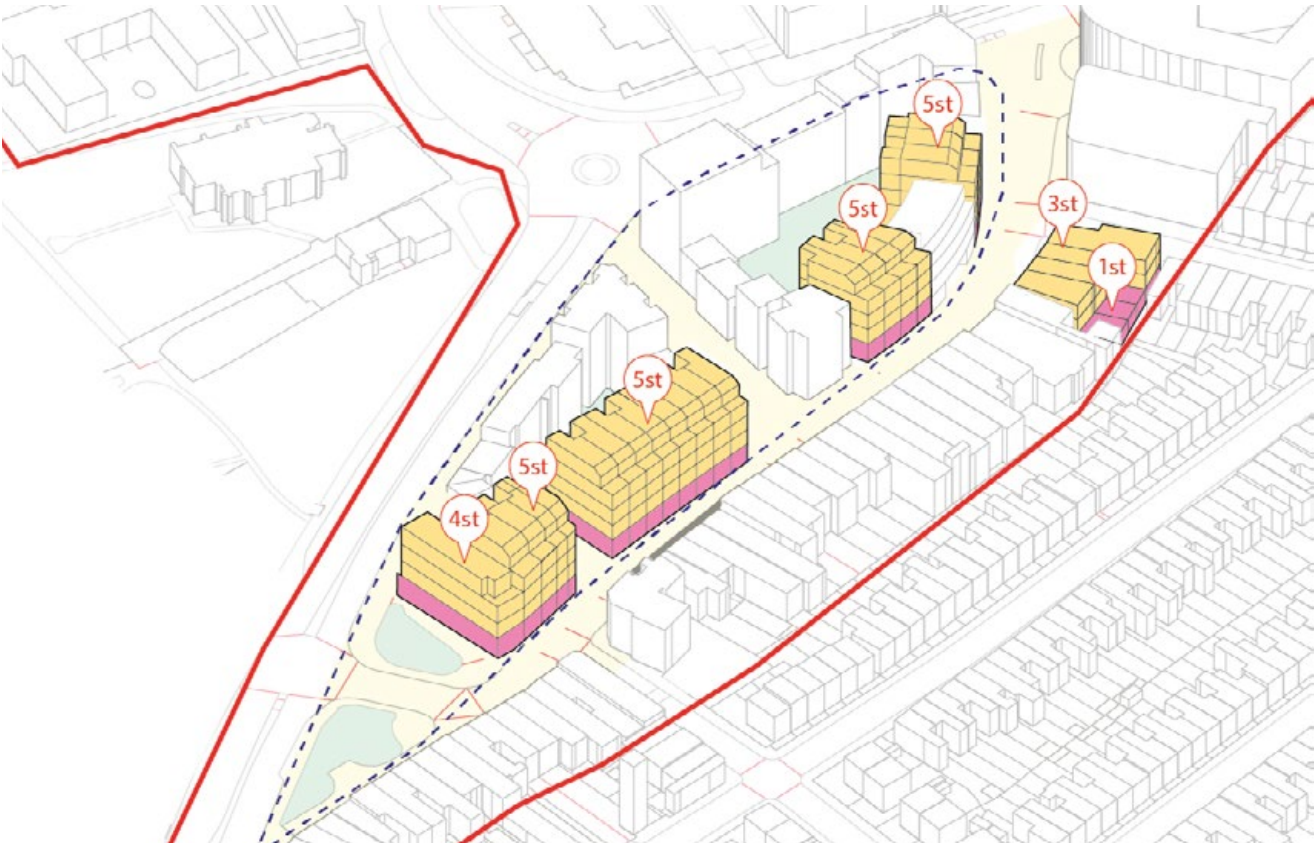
Proposed Massing BSSA3 indicating 3-5 storeys (9m-15m). Hawkins\Brown Masterplan Report
